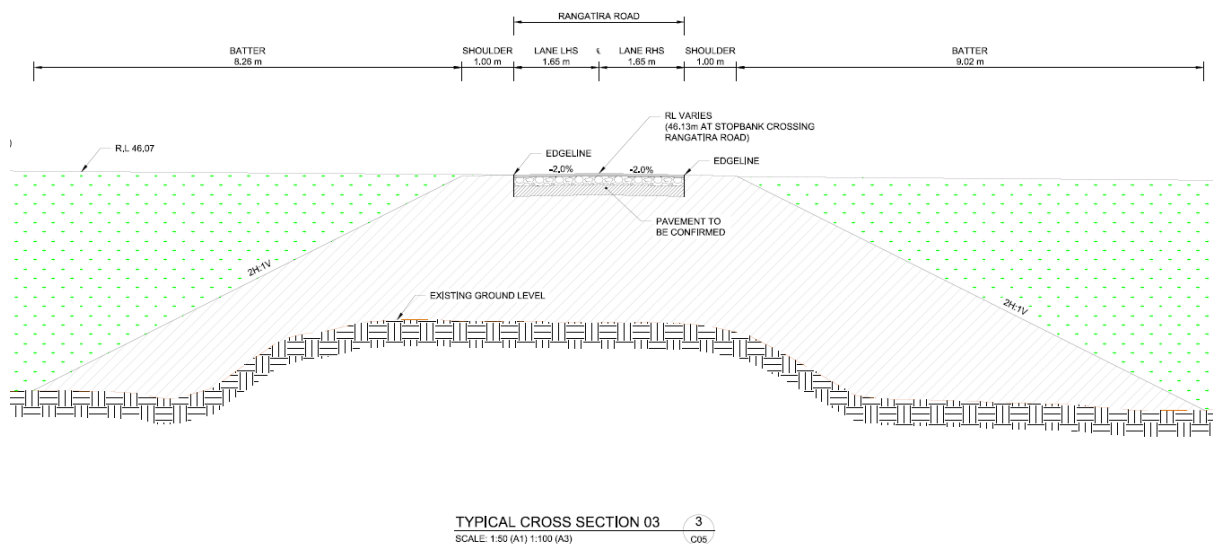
Proposed Cross-section on the approach to the Rangatira Bridge
